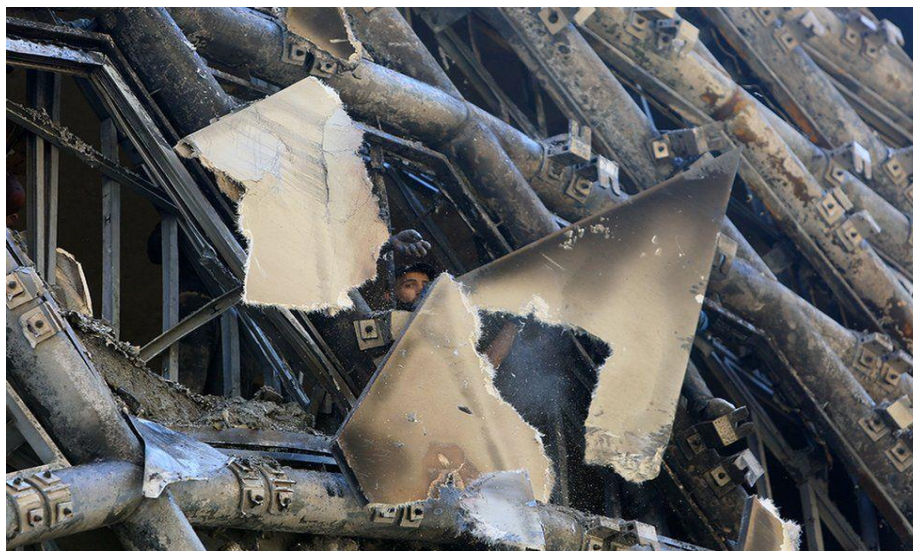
Fire Damaged Lebanon: Zaha Hadid's building in Beirut in flames [92].
